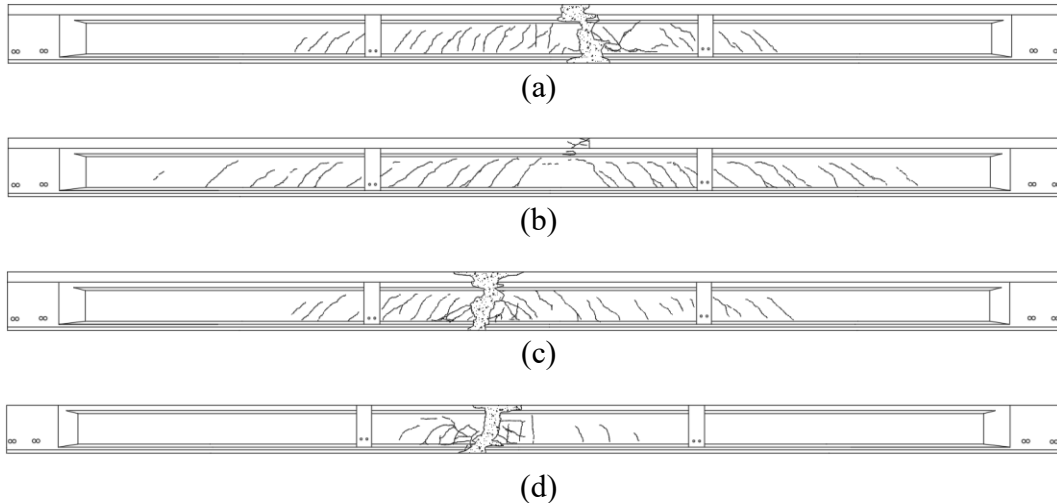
Crack pattern after failure: (a) B3-P47/46, (b) B8-P47/46, (c) B4-P47/46, (d) B9-P47/46 girder.
